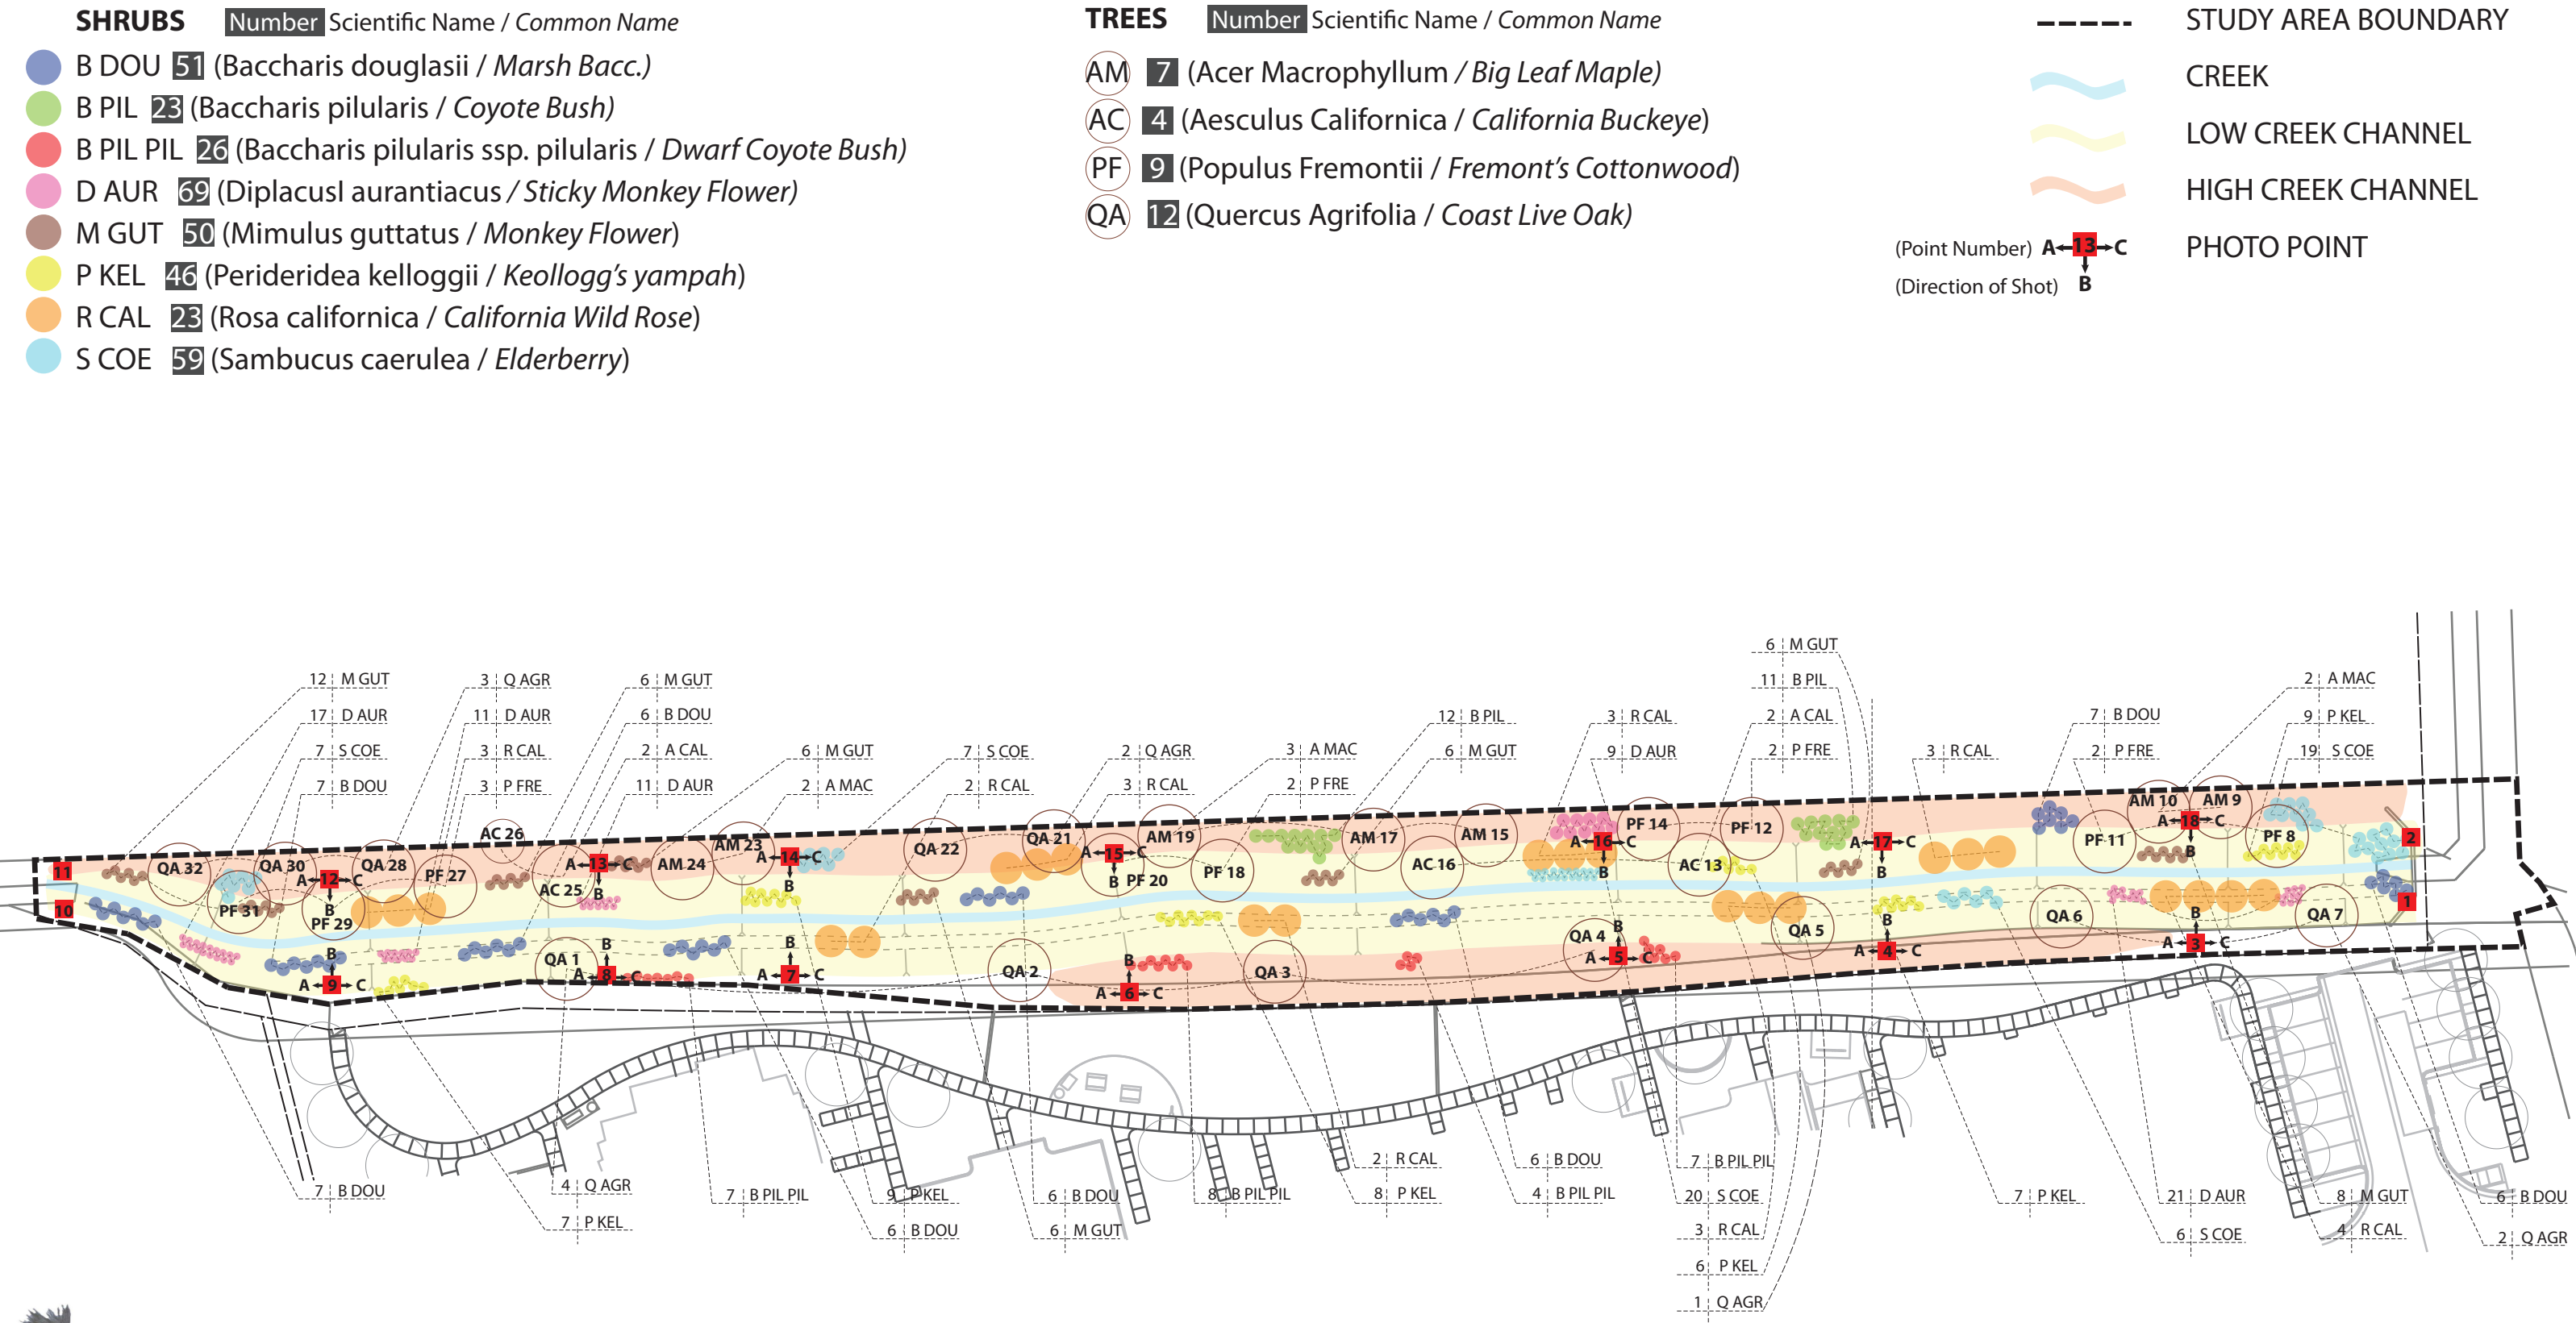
Planting Plan and Permanent Photo-monitoring Locations
